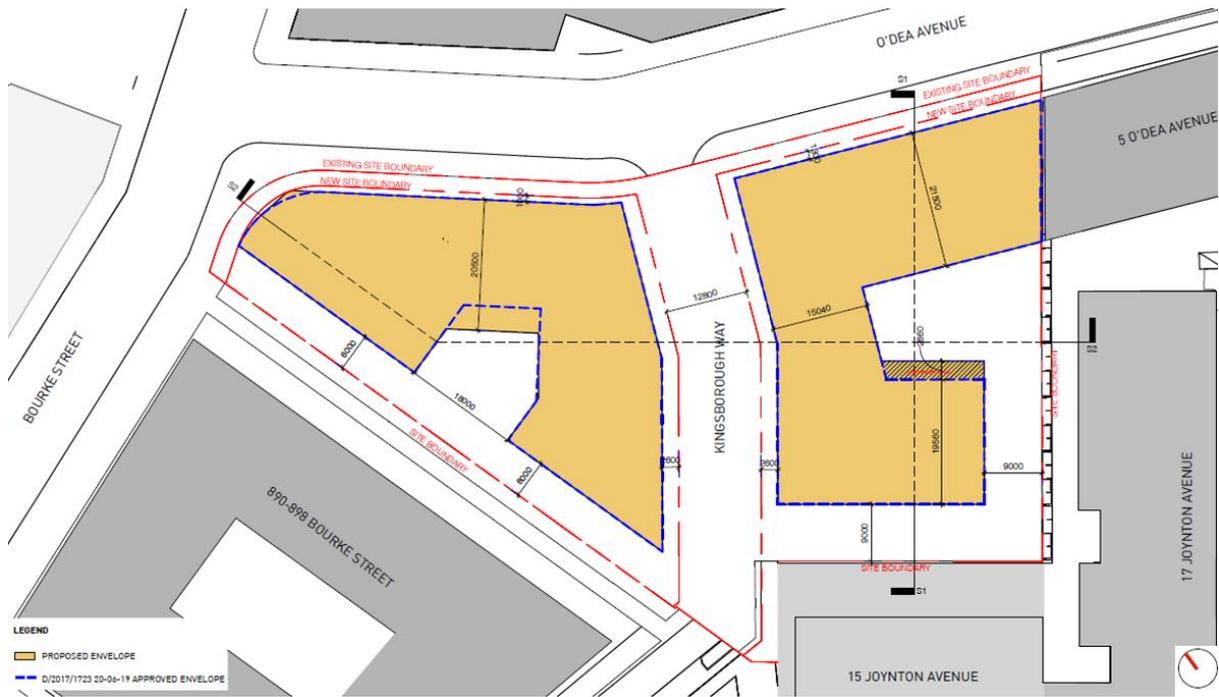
Proposed ground floor and level 1 envelope plan. Levels 2 and 3 are similar. Approved concept building envelope outlined in blue.
